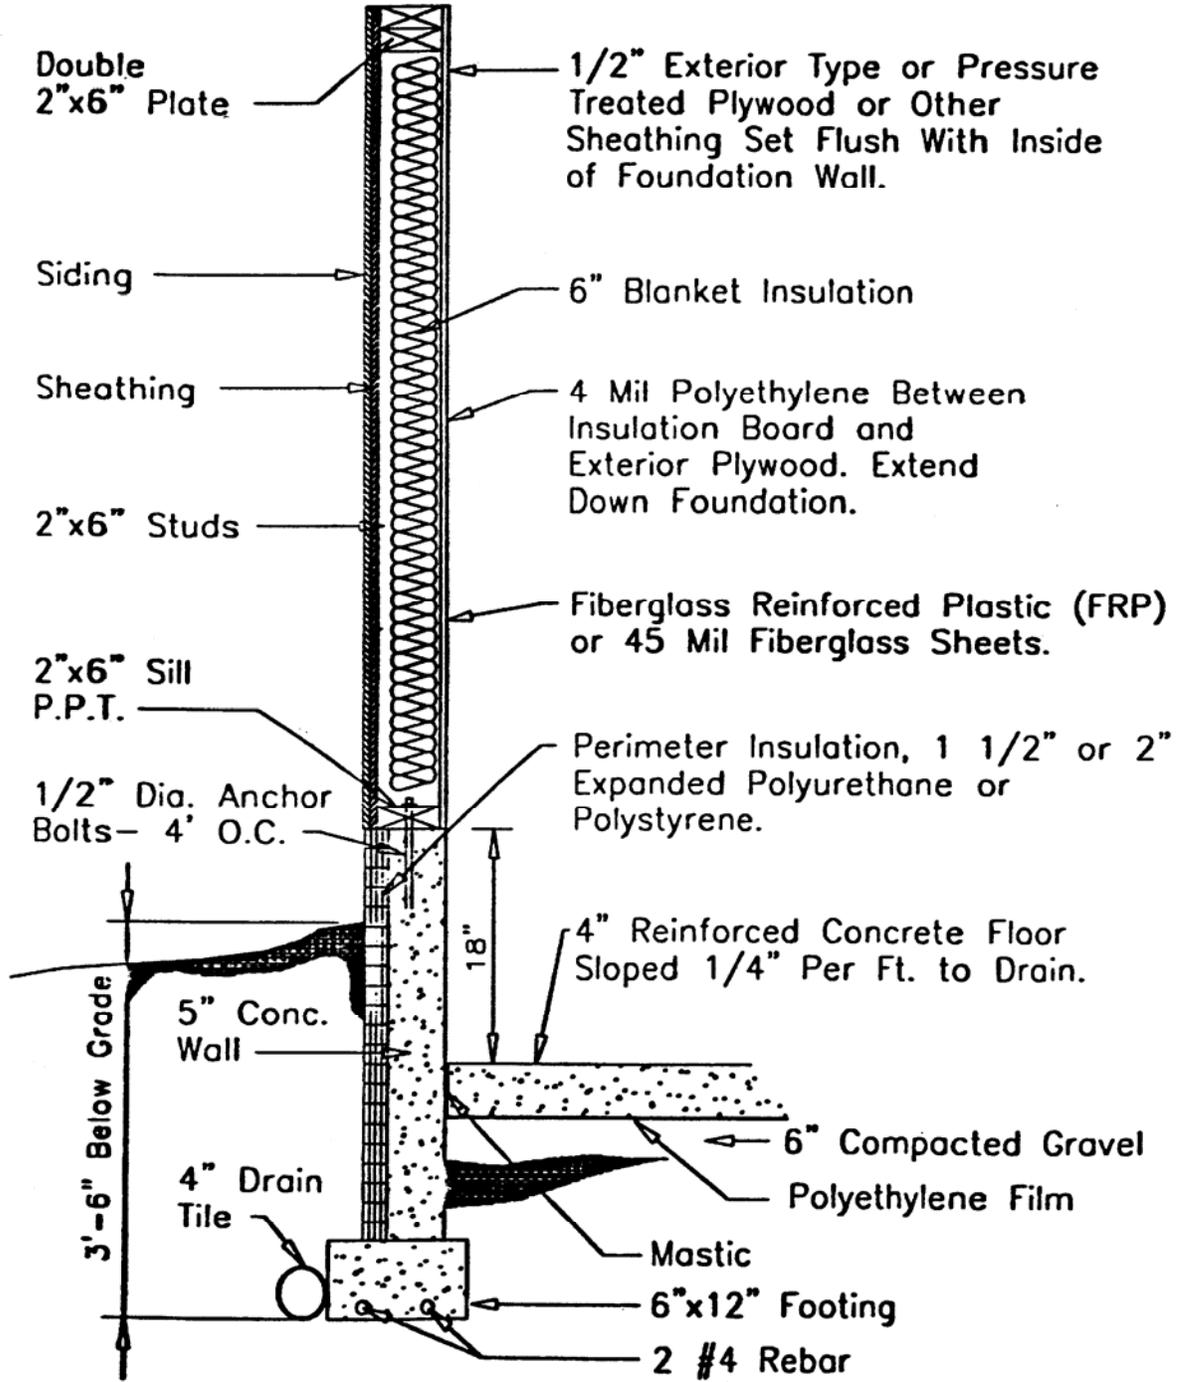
SECTION SHOWING ONE EXAMPLE OF STUD WALL CONSTRUCTION.
